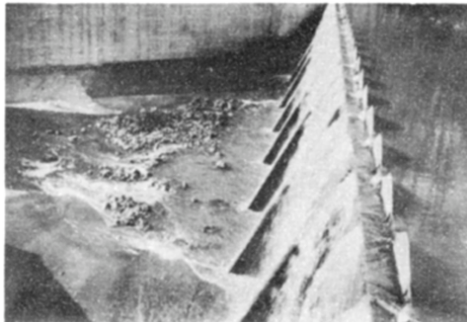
U.S.G.S. gaging station at Lake Bracken; artificial control consisting of calibrated iron V-notch weir plates along the spillway crest.
